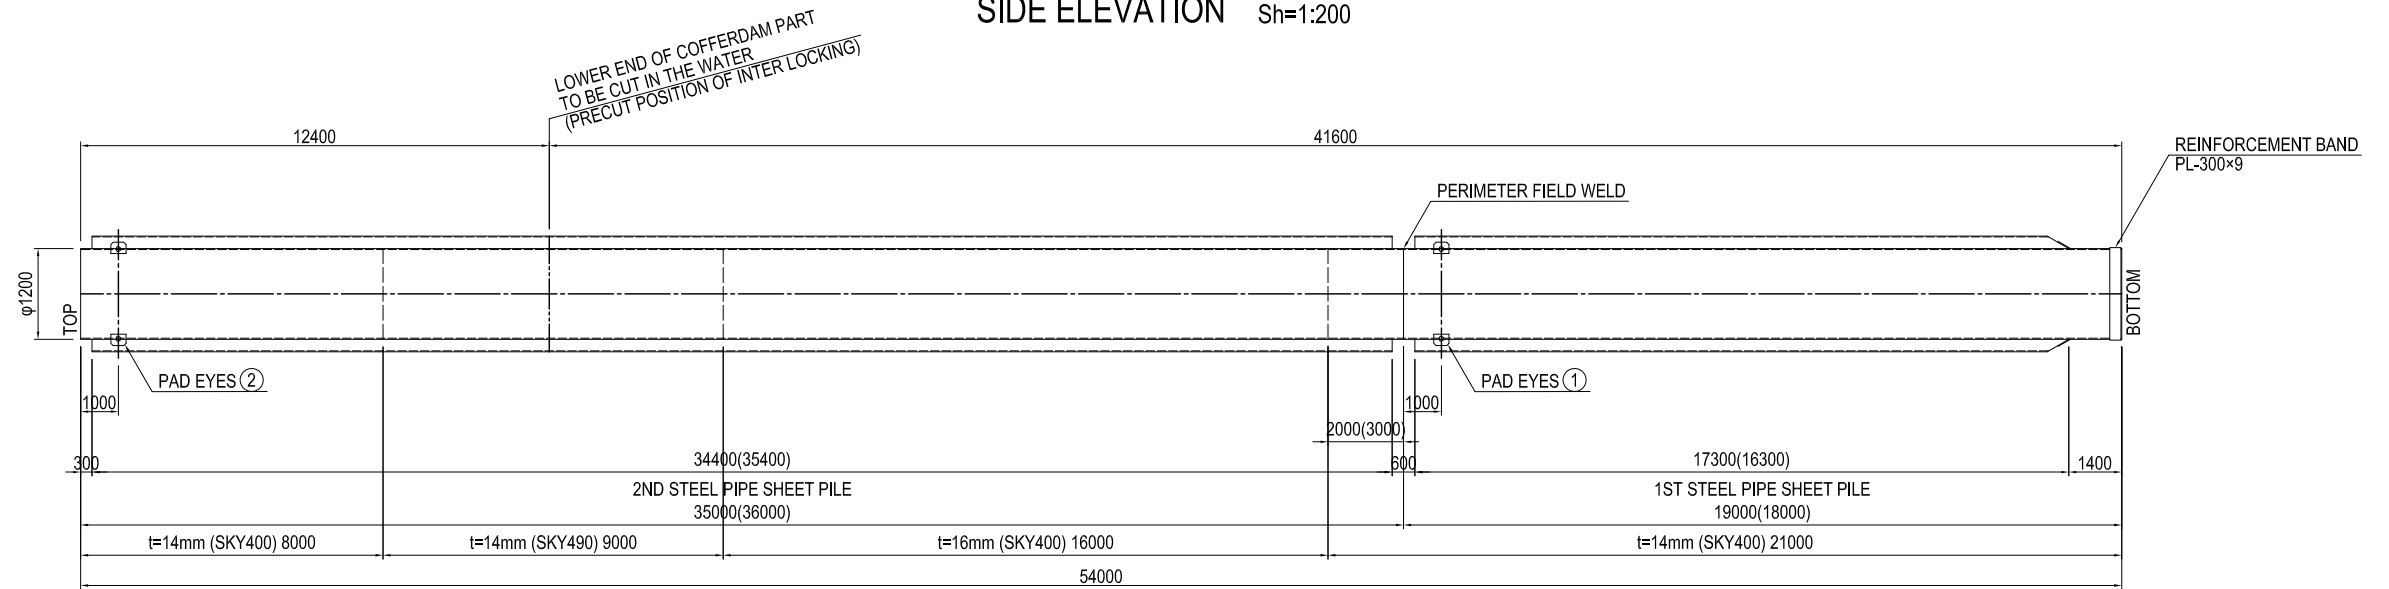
# DETAIL OF STEEL PIPE SHEET PILE OF P14 PIER (1)
